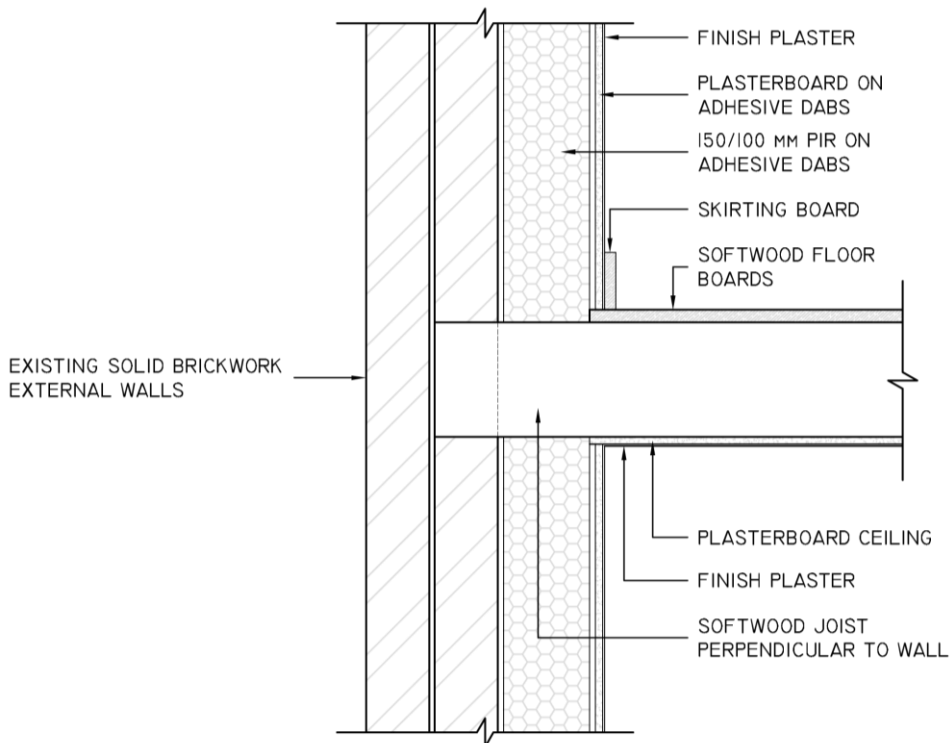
Intermediate Floor Junction with Joist Perpendicular to External Wall
